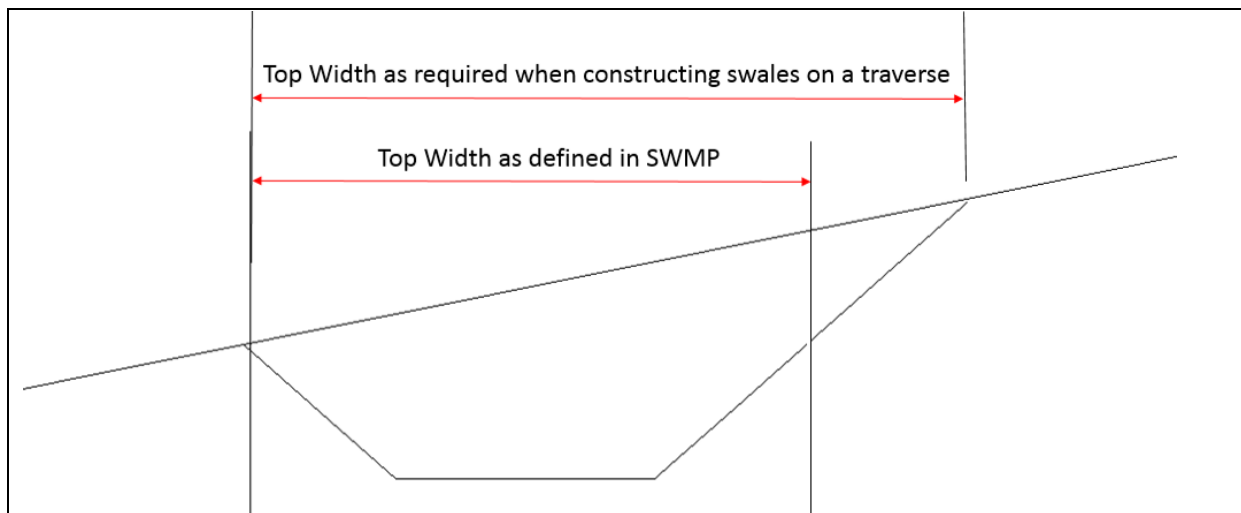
Schematic cross section of swale assets constructed on a traverse requiring land take in addition to the flood water “top width”
